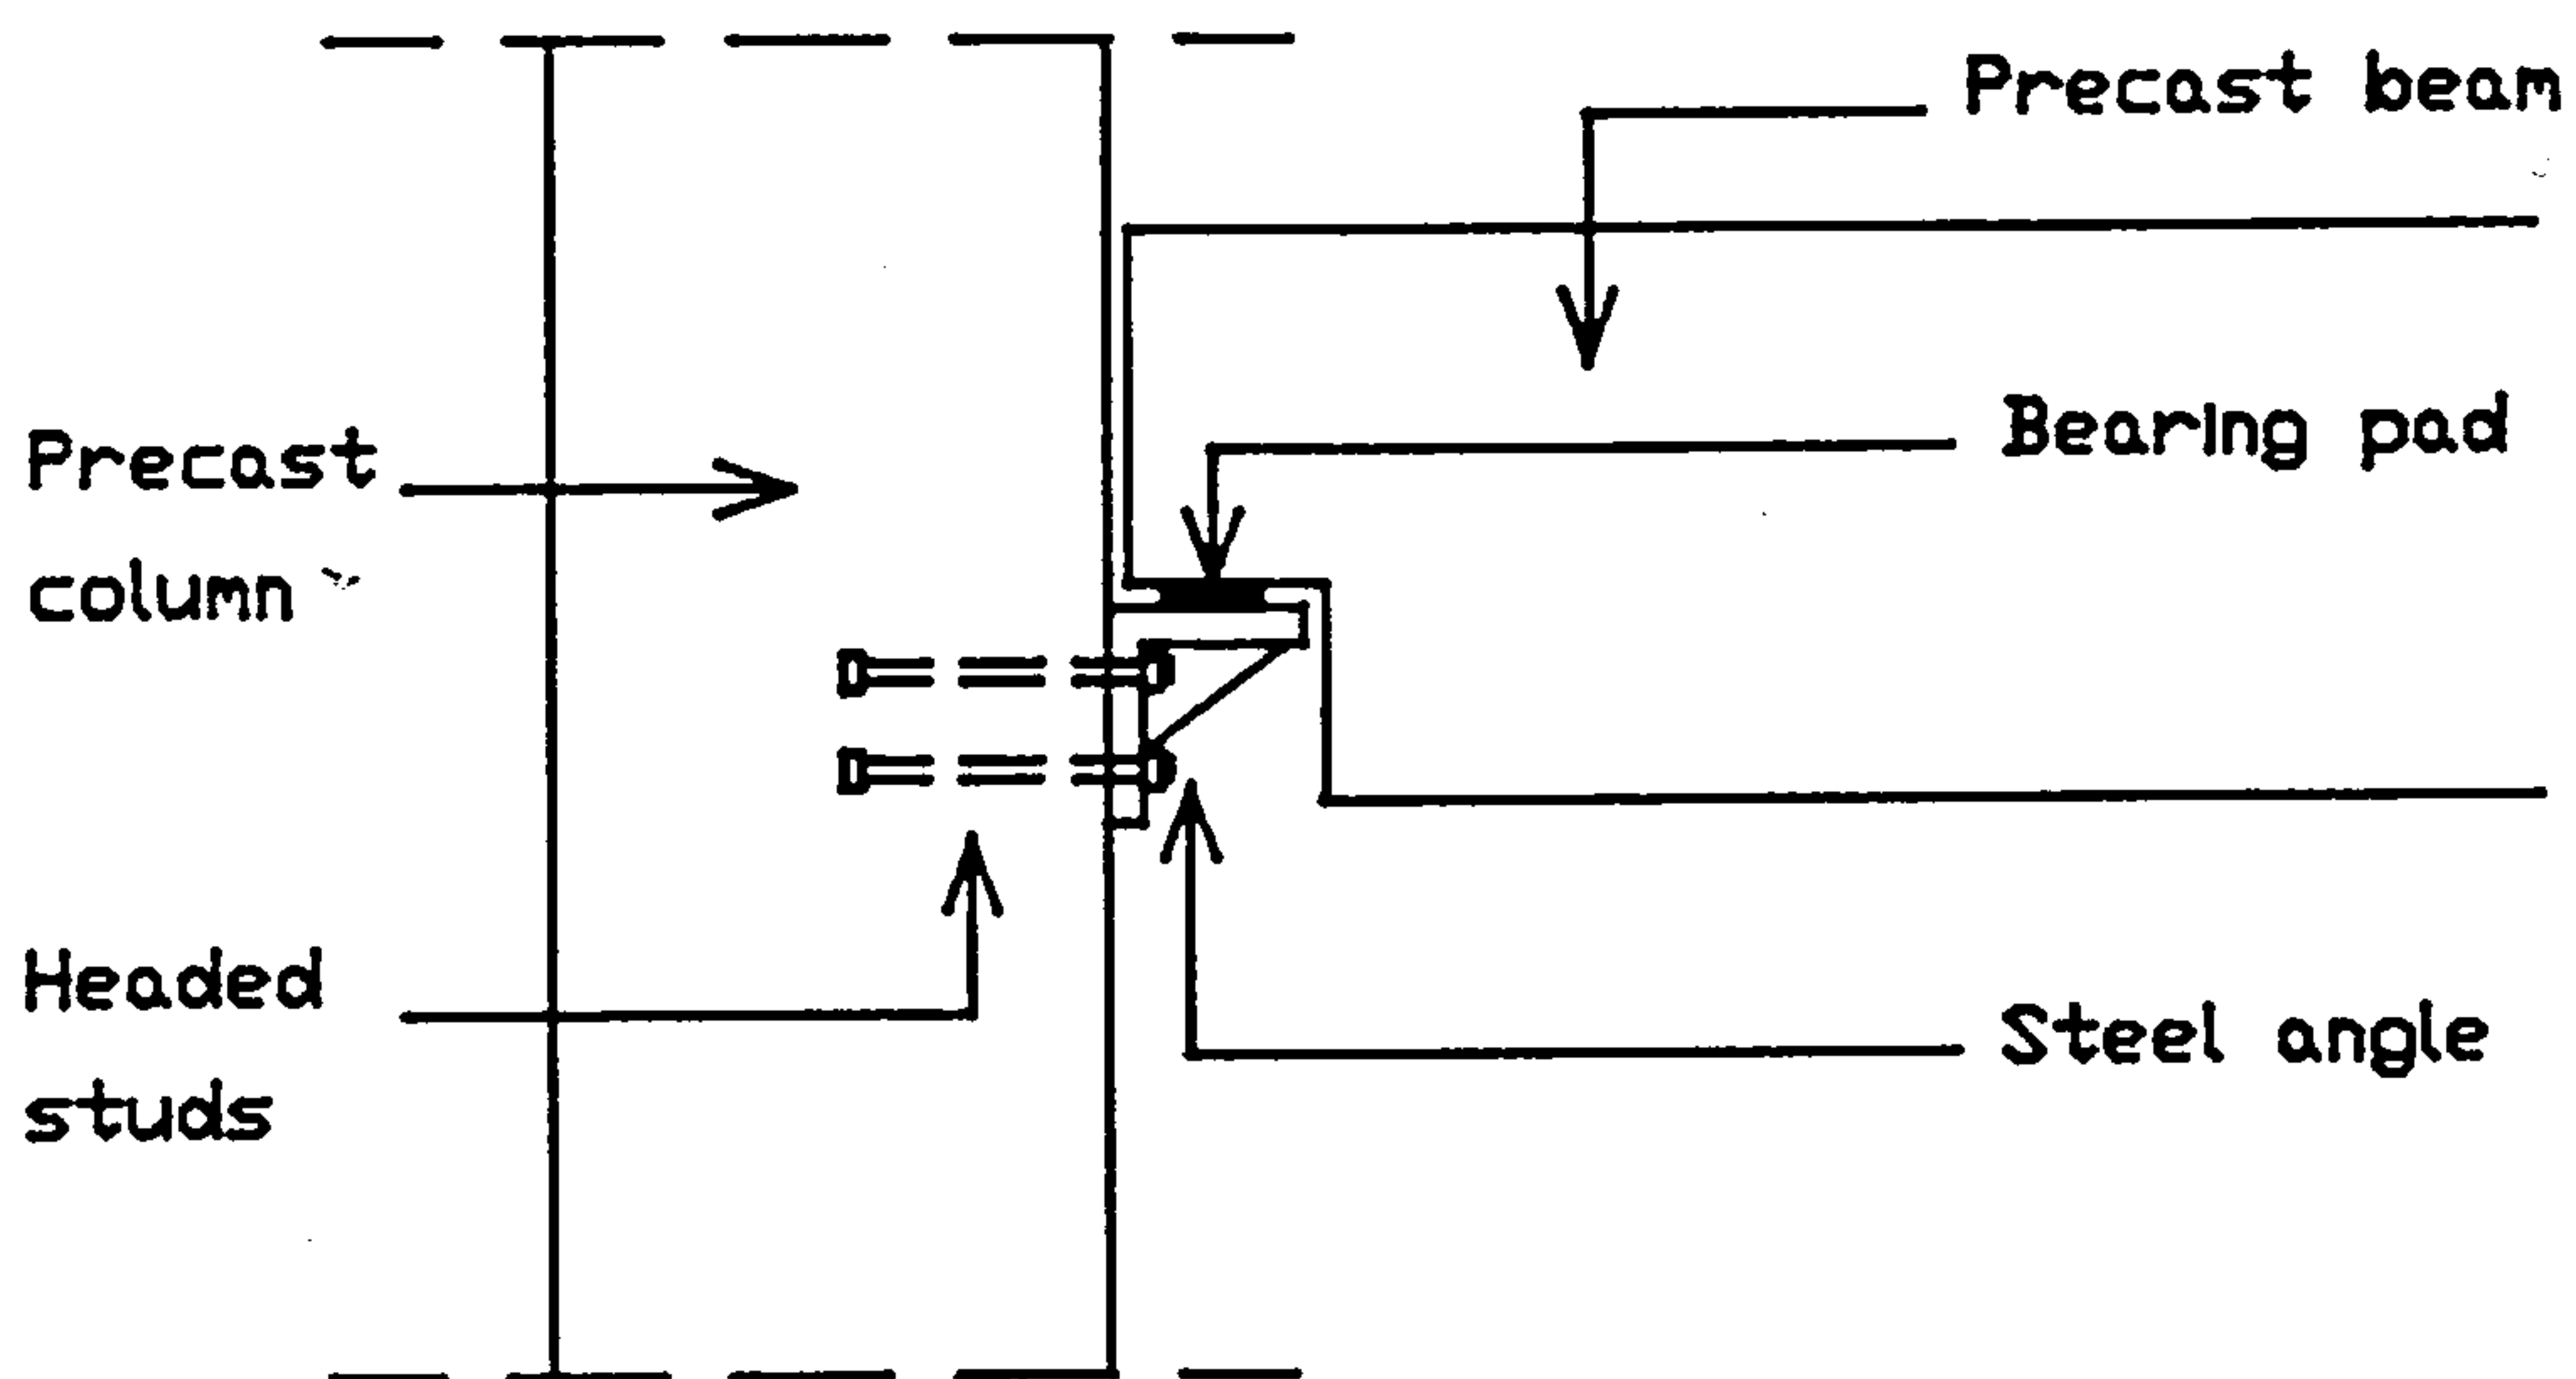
A BEAM-TO-COLUMN CONNECTION USING HEADED STUDS.
